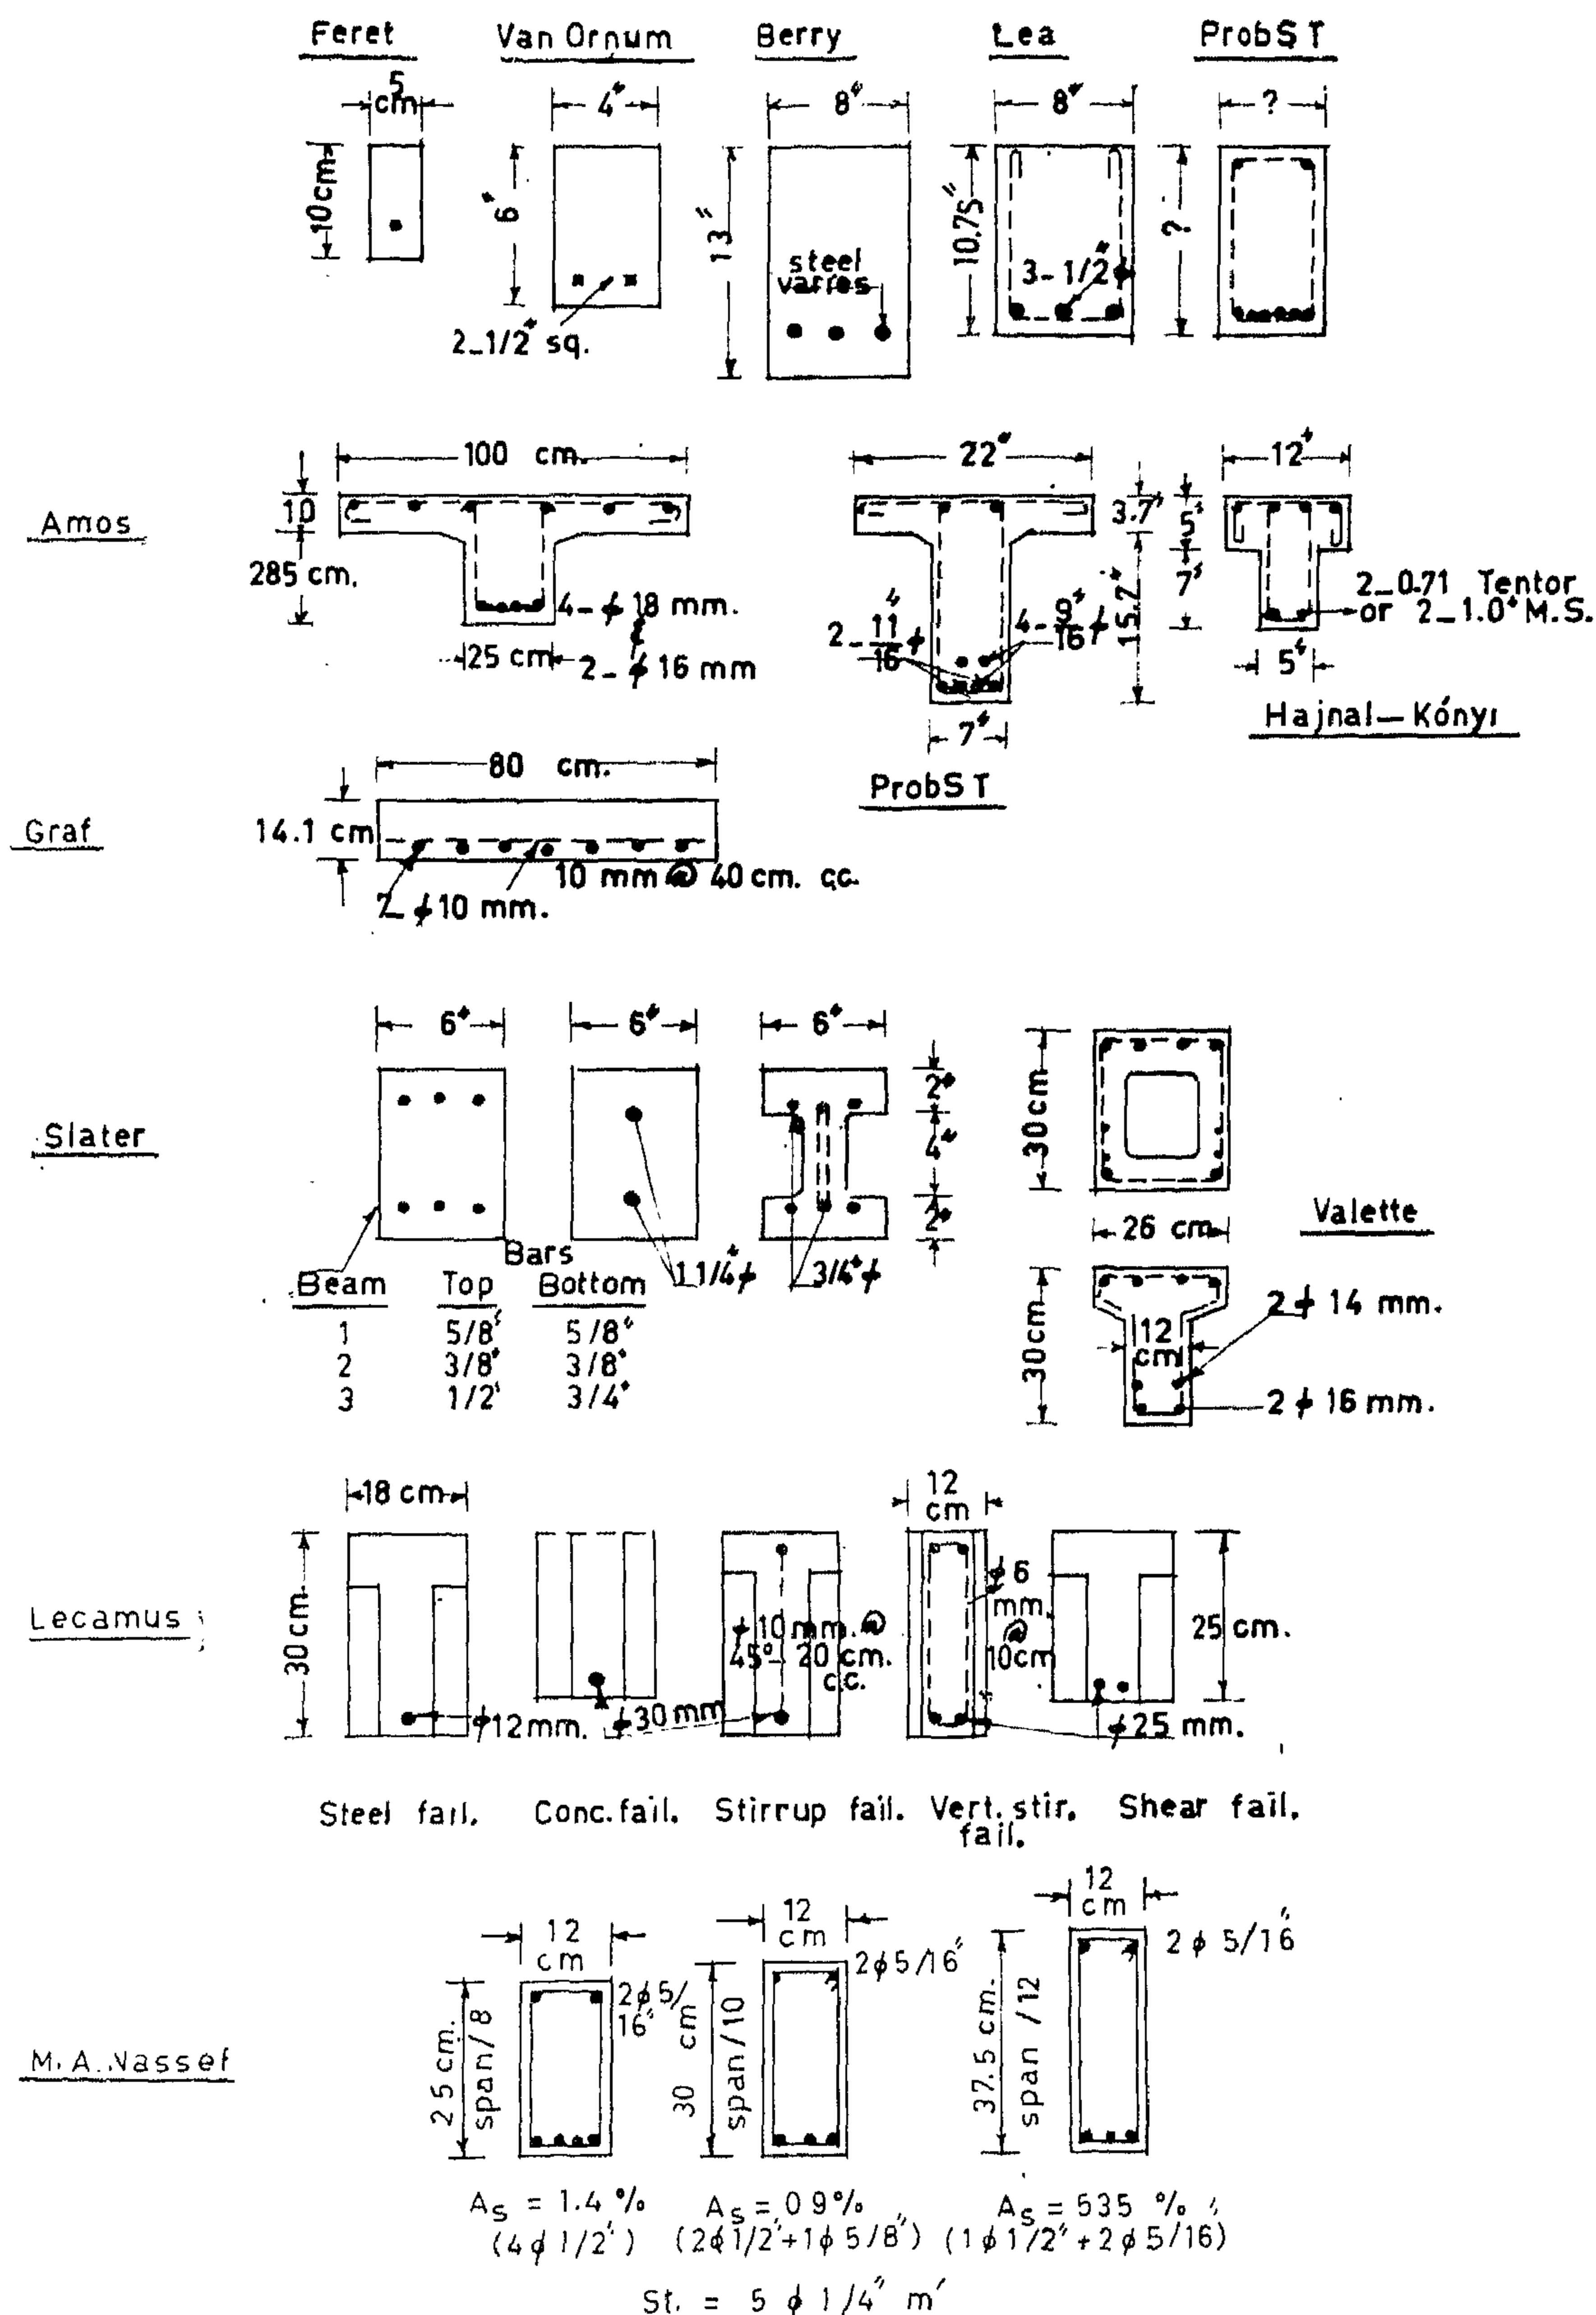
CROSS SECTION OF SOME OF THE REINFORCED CONCRETE. BEAMS TESTED UNDER REPETITIVE LOADING.
